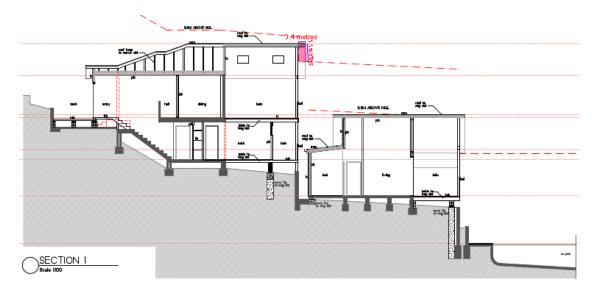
Area above 8.5m height plane highlighted in purple and calculation of slope under the building footprint
